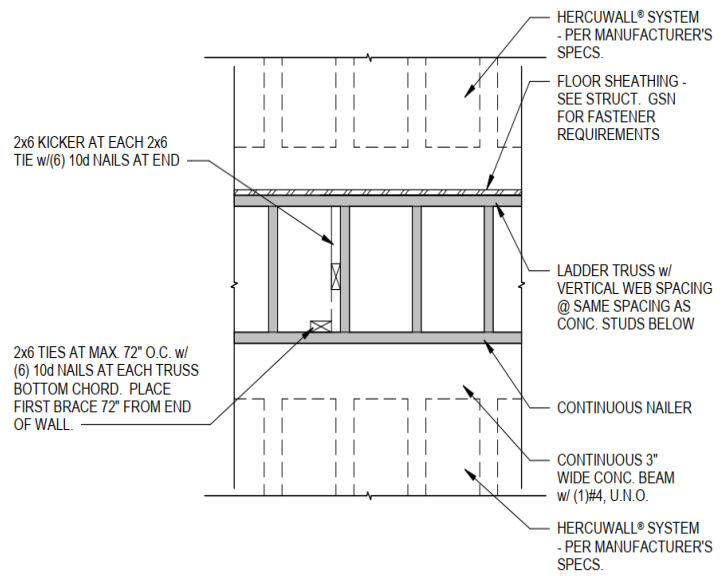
HercuWall® Truss Perpendicular to Wall (Section)
